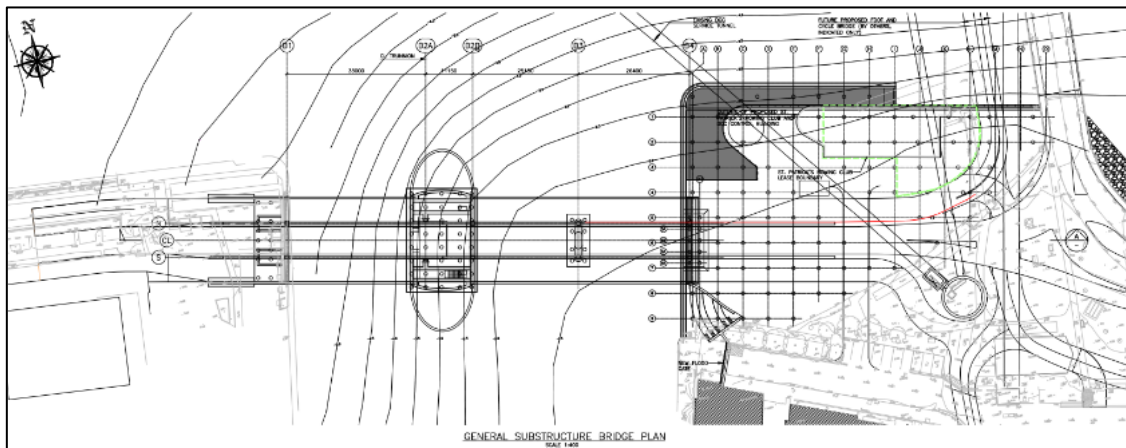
Plan view of proposed bridge over the River Dodder at Area E.
